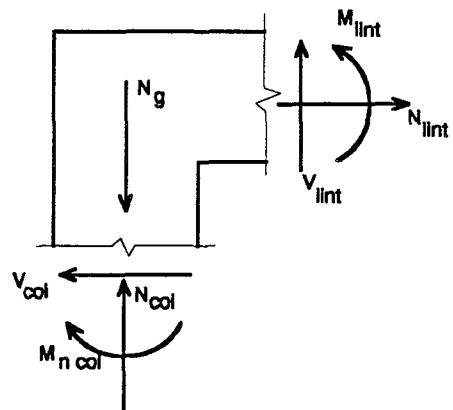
Forces acting on the roof lintel-column connection of Specimen 1b under southward loads.
